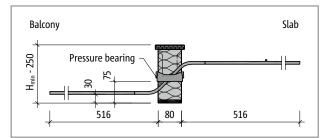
Schöck Isokorb® T type Q-V7 for Q-V8: Product section
